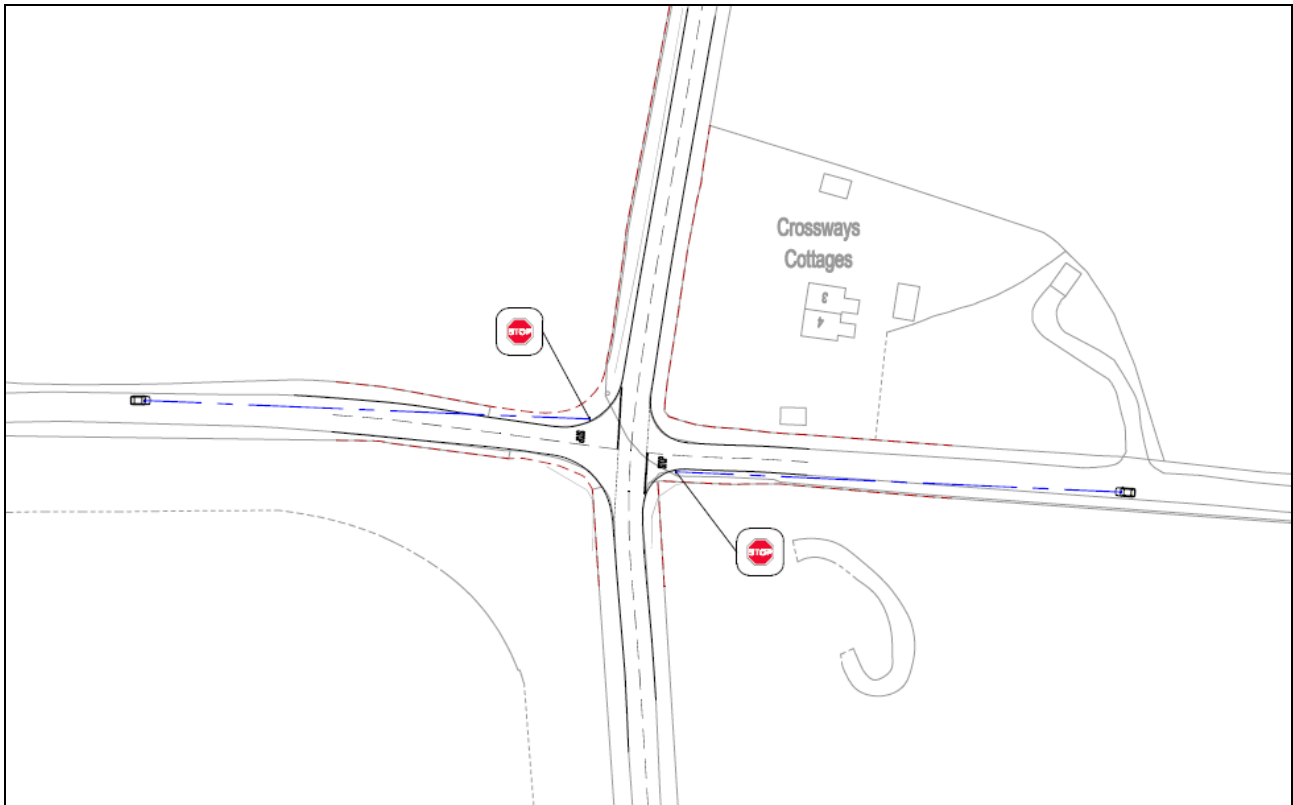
Proposed modified junction layout AECOM drawing 60445024-SKE-C-008-A
